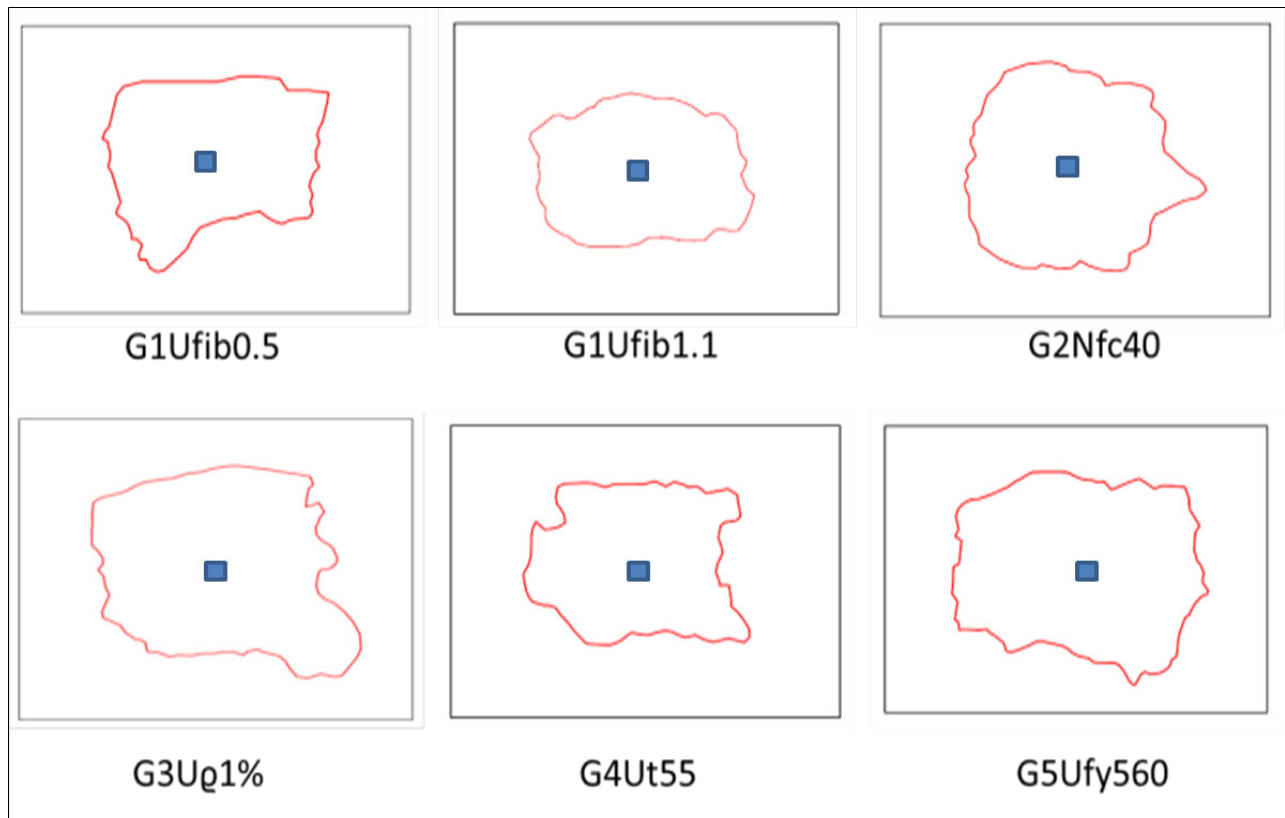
Failure perimeter at tension surface for each tested slab
